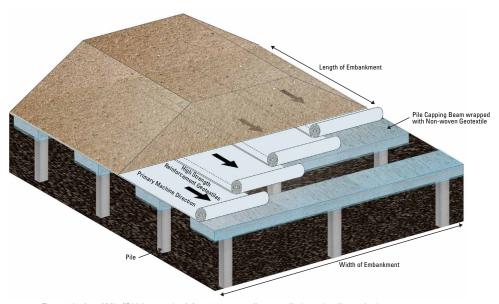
Laying of Mirafi® high strength reinforcement geotextile perpendicular to the pile capping beams
